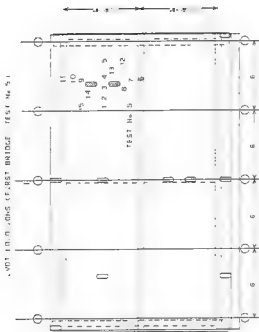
LVDT Locations (First Bridge - Test No 5)
